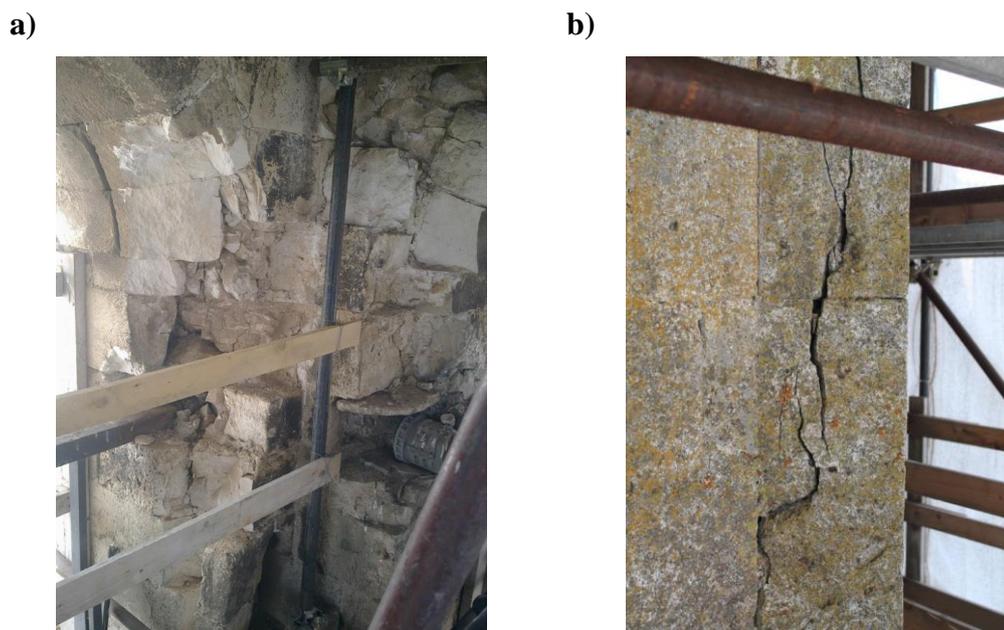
Detail a) masonry layers; b) crack pattern at the first level.
